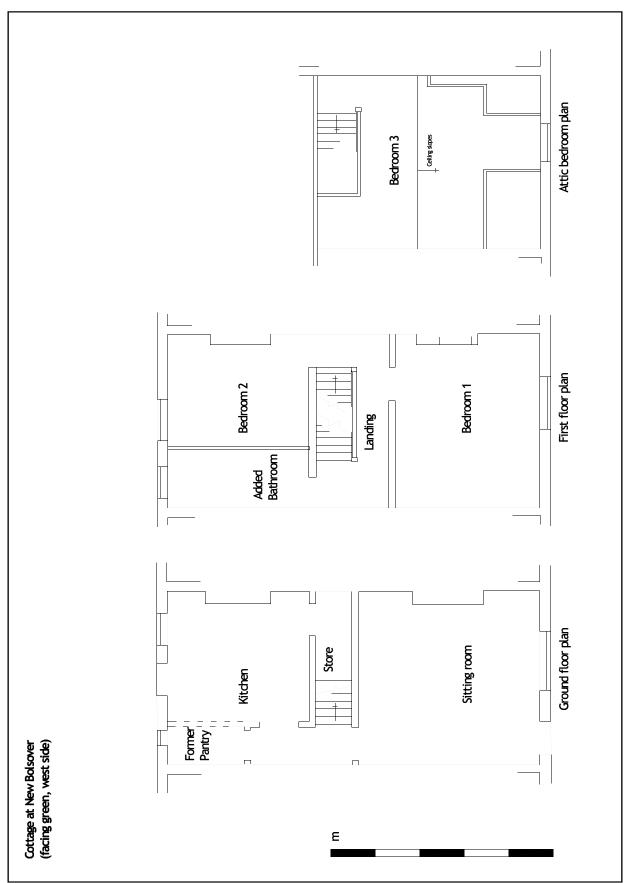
Floor plans of a 3-bedroom cottage at New Bolsover. Not to scale.
